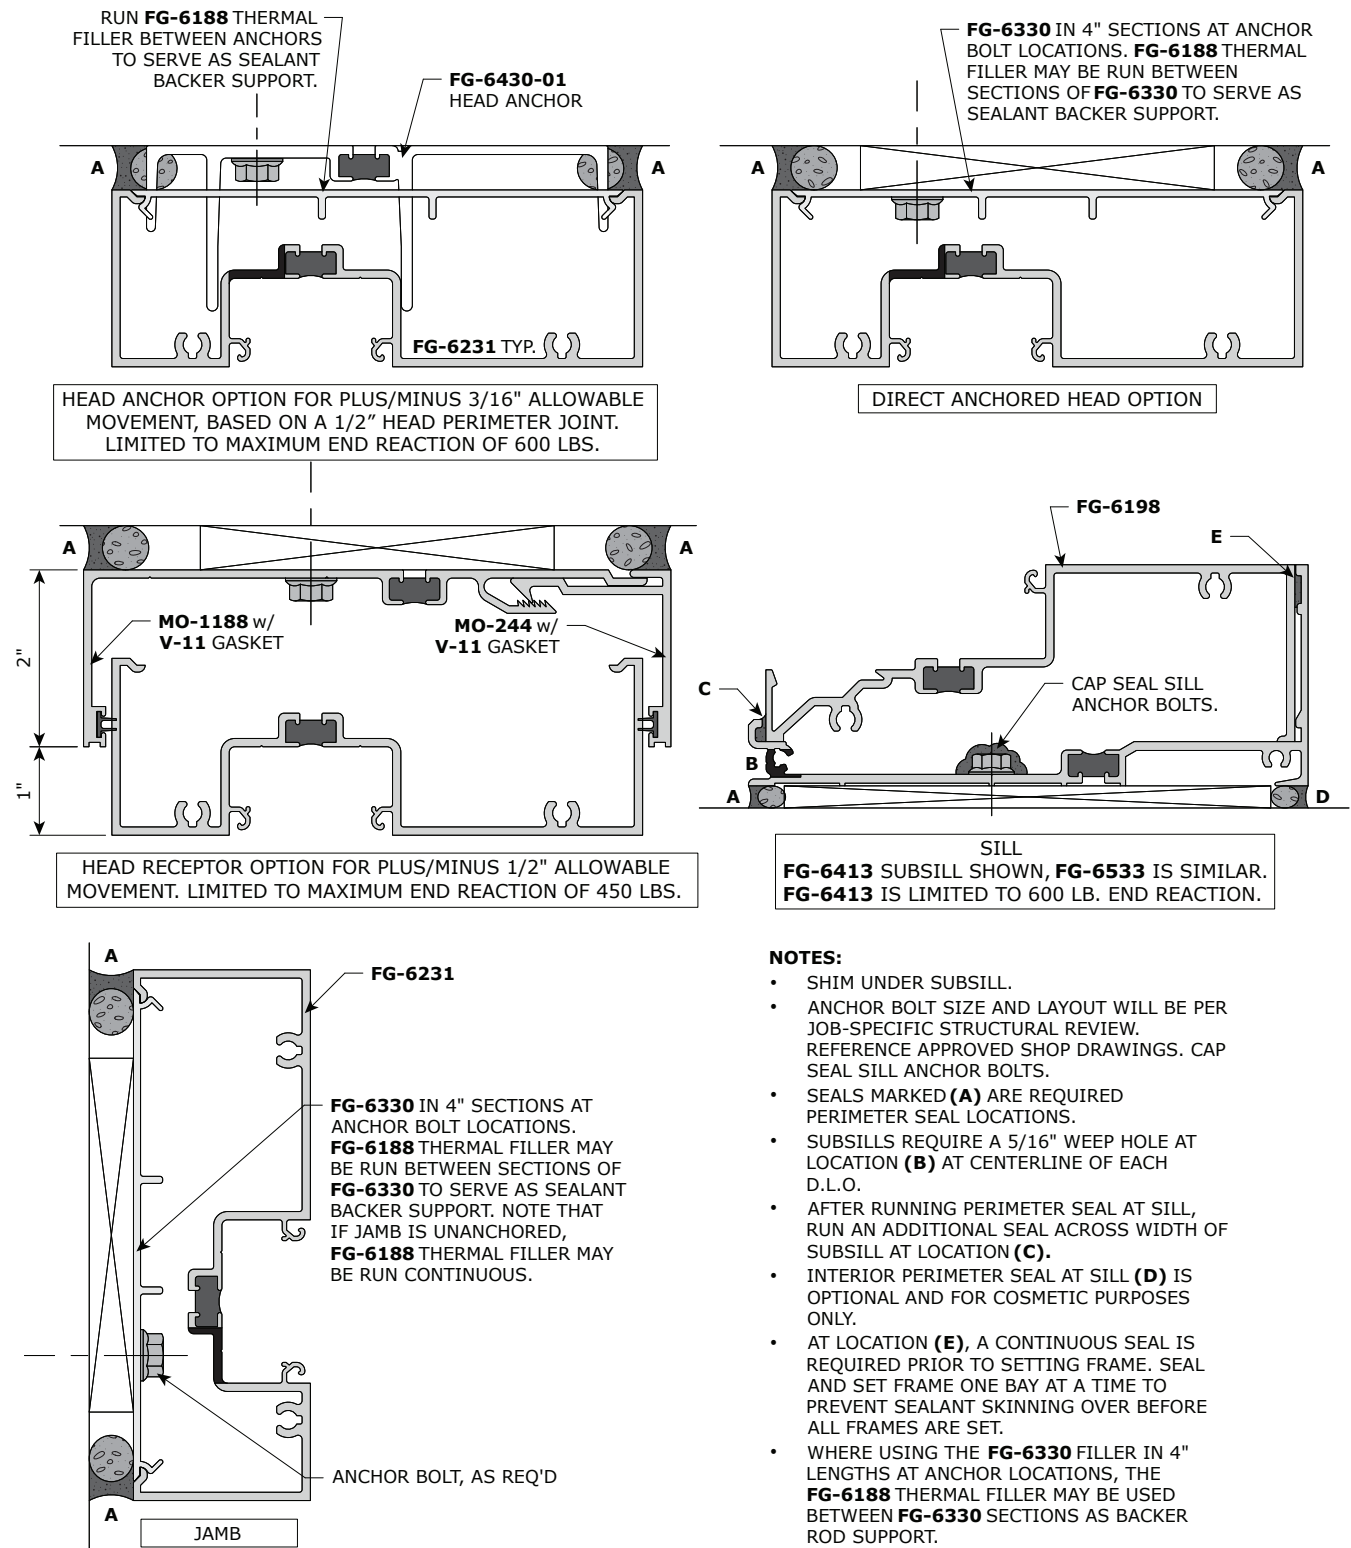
Frame Anchoring and Perimeter Seals - Center Set Systems
